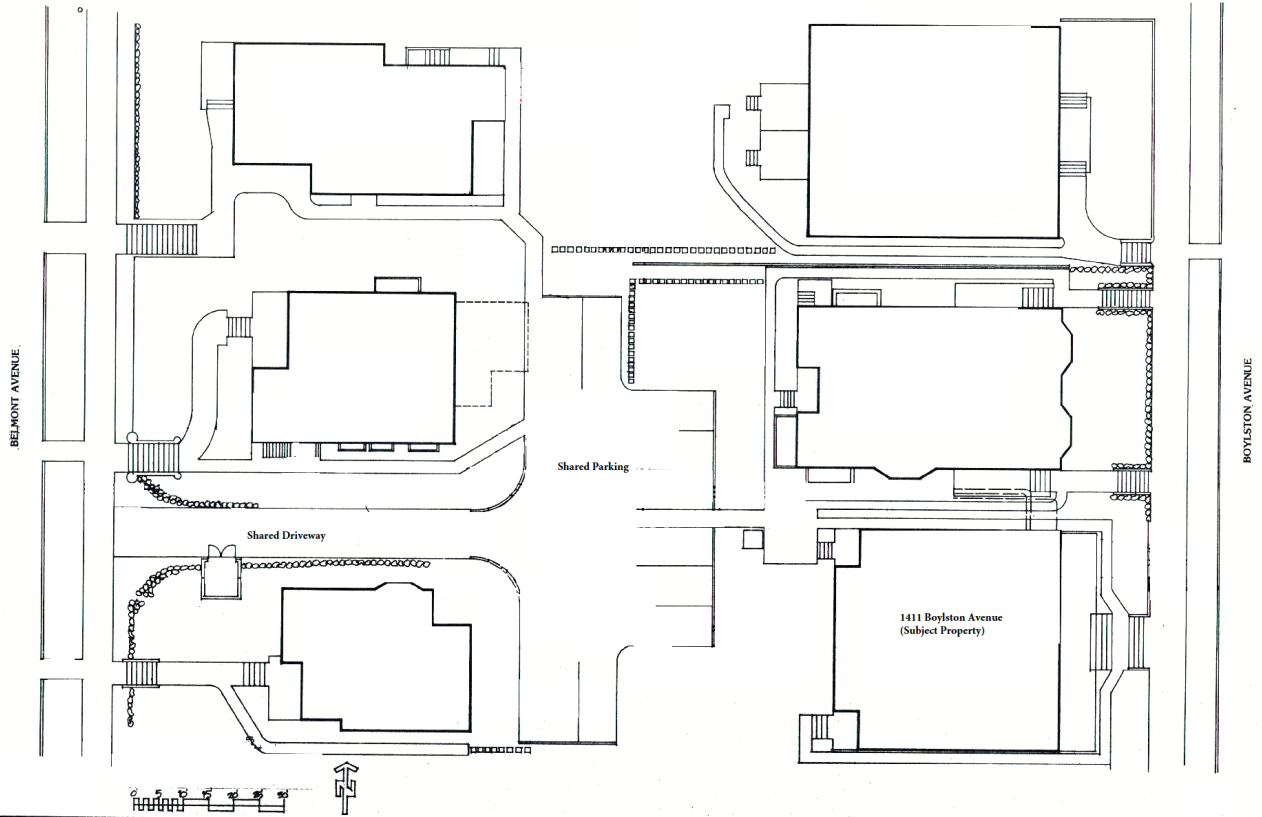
Site plan of Bel-Boy houses showing relationship of sites, shared driveway off Belmont. 1411 Boylston Ave is at the lower right, edited from Stickney & Murphy site plan.
